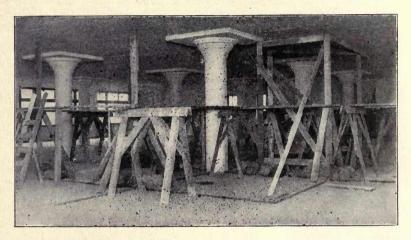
FRANKS BUILDING TEST; OBSERVATION PLATFORM AND DEFLECTION FRAMEWORK.
